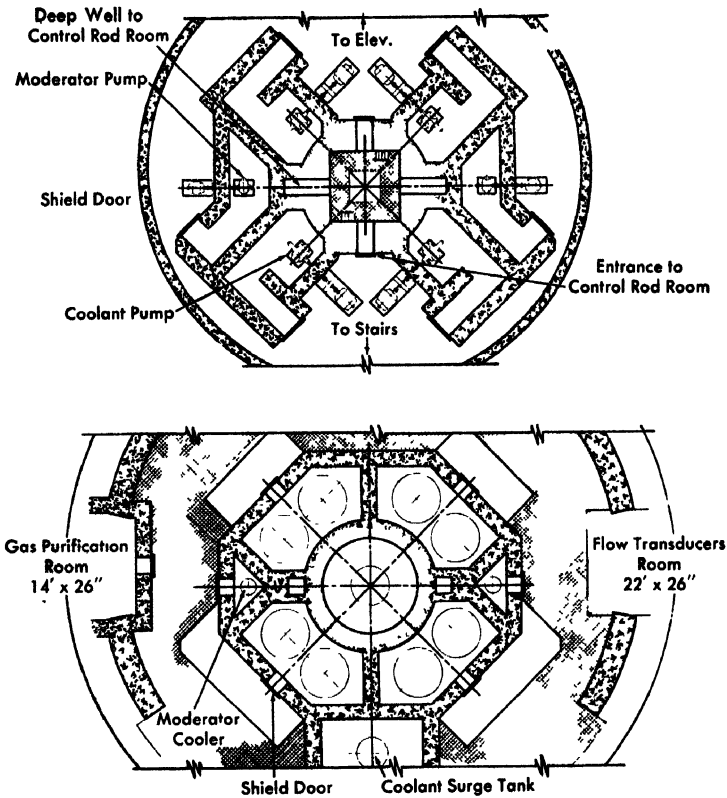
Plan view of reactor building at elevations of -23 feet and +1 foot
